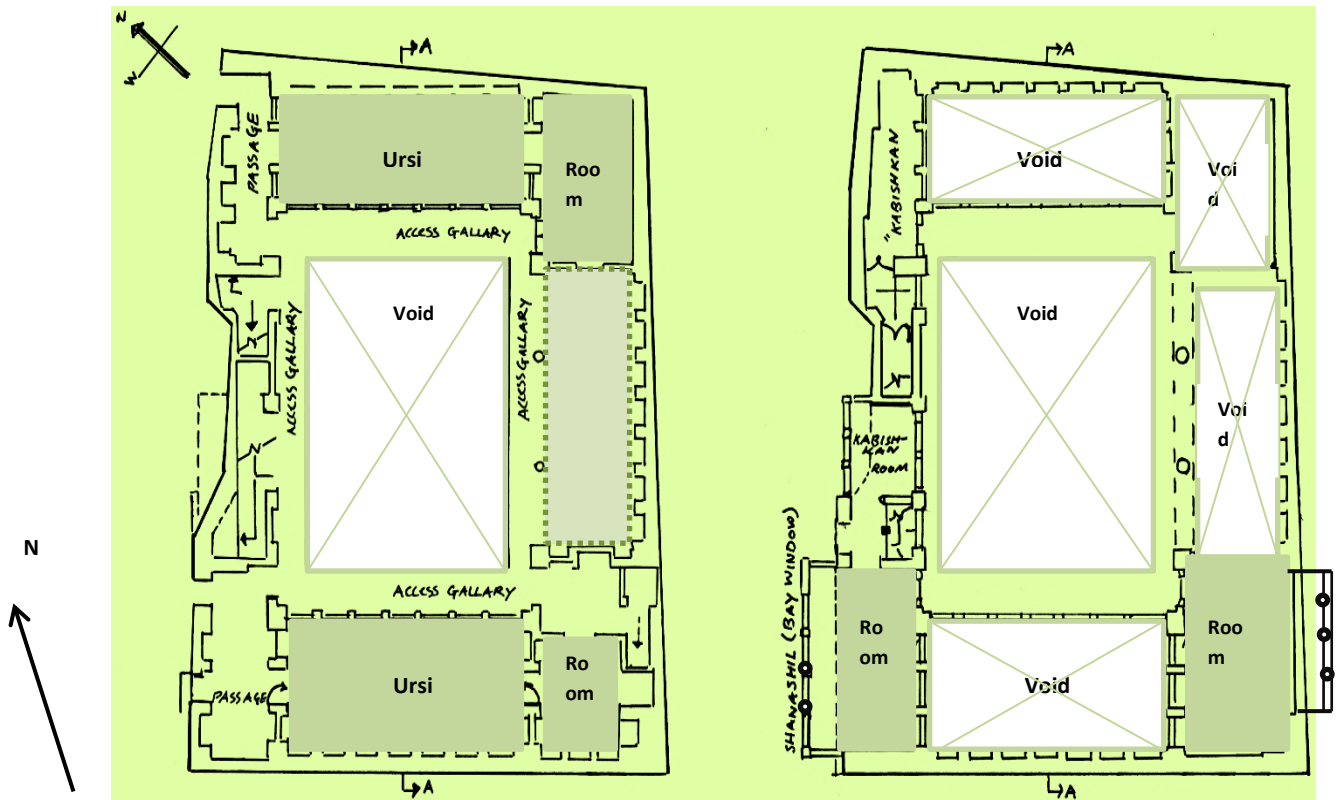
First floor level & second floor level plans of traditional house No. 2. Scale: 1:50 (Researcher)
